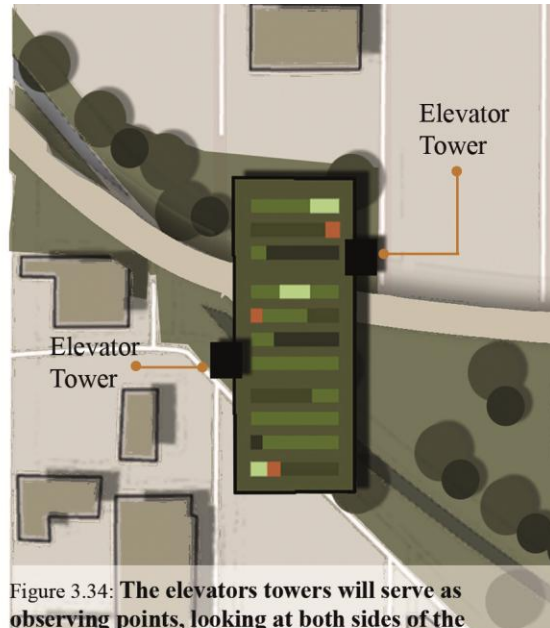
The elevators towers will serve as observing points, looking at both sides of the neighborhood, which now can only be seen from one side of the viaduct.
